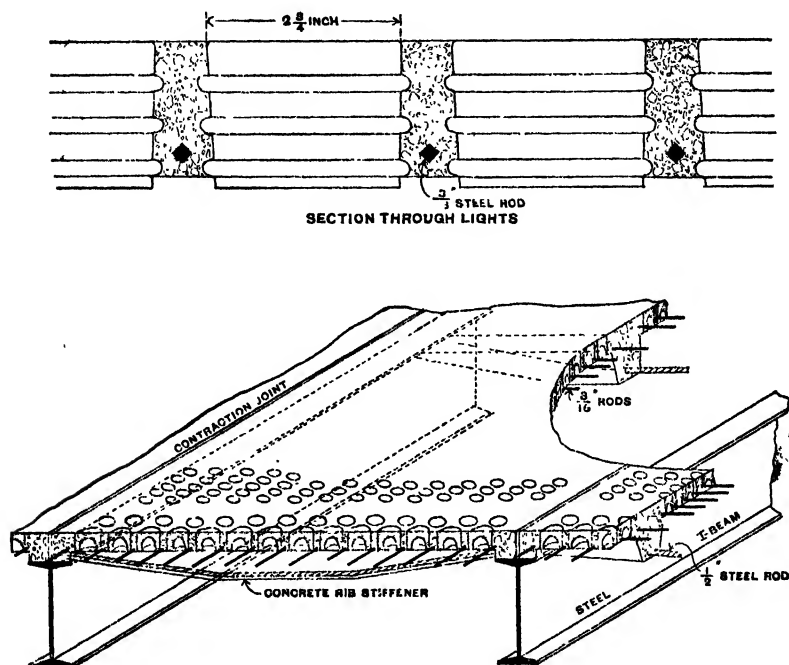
Typical Vault Light Construction. (See p. 602.)
